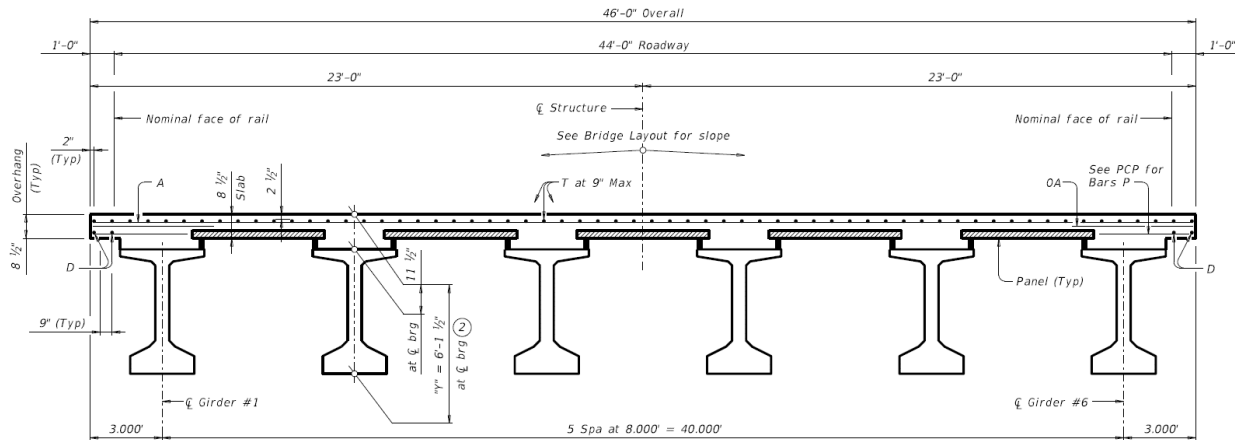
Typical Bridge Cross-Section Using Tx62 I-Girders (TxDOT 2019).
